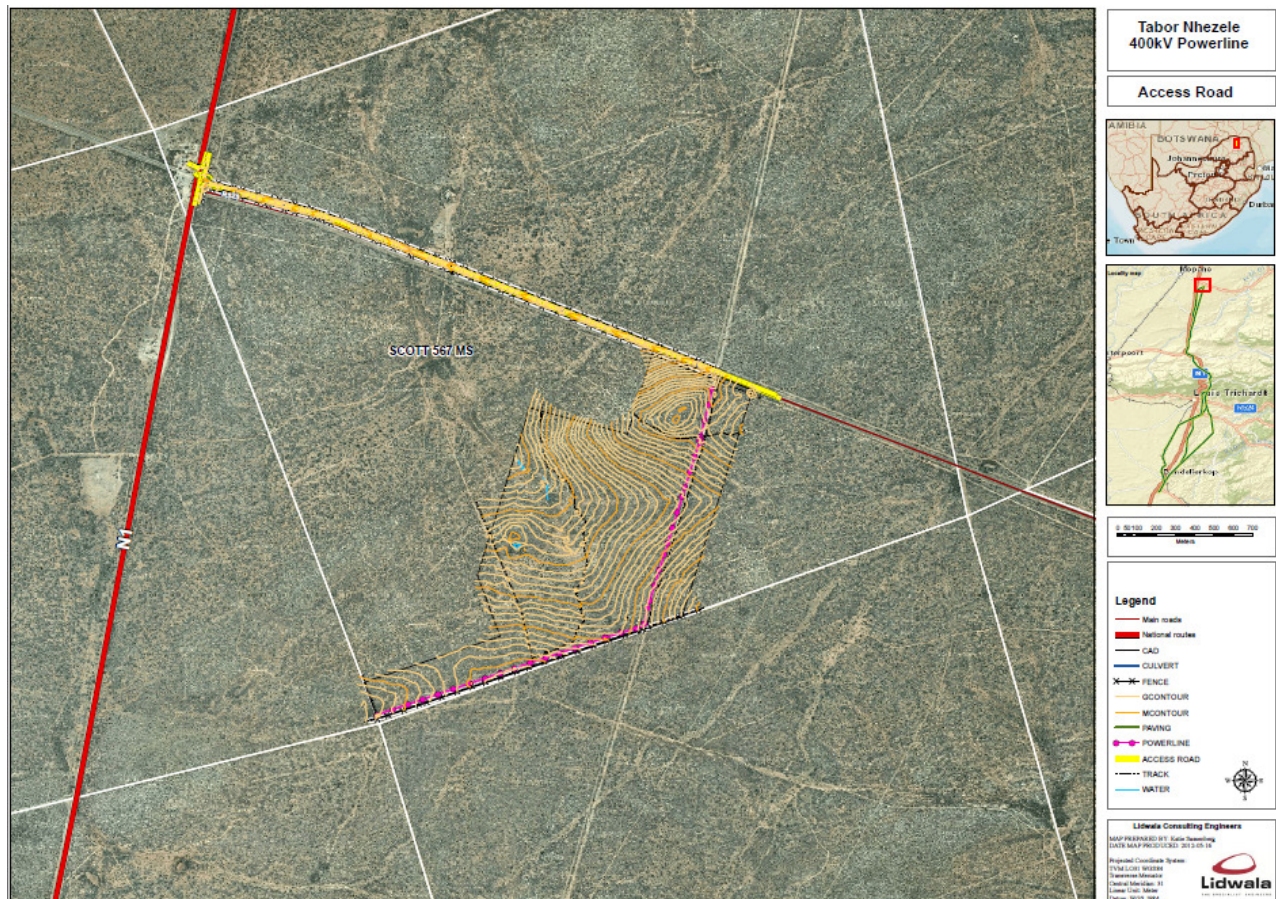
Proposed formal access road to the proposed new Nzhelele substation
